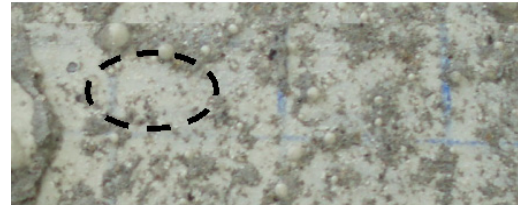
Tg of epoxy adhesive collected from fracture surface
